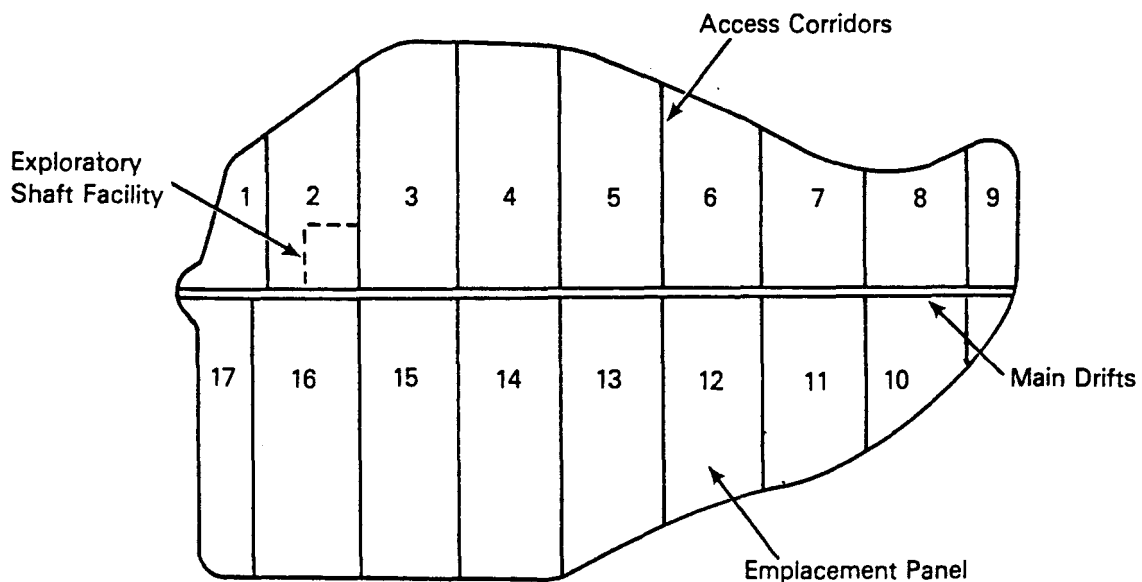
Repository Underground Facility Description - Plan View (MacDougall et al. 1987)
